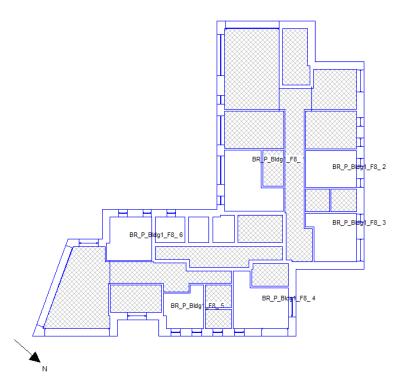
Level 8 bedrooms in Building 1 (larger plan in Appendix A)
